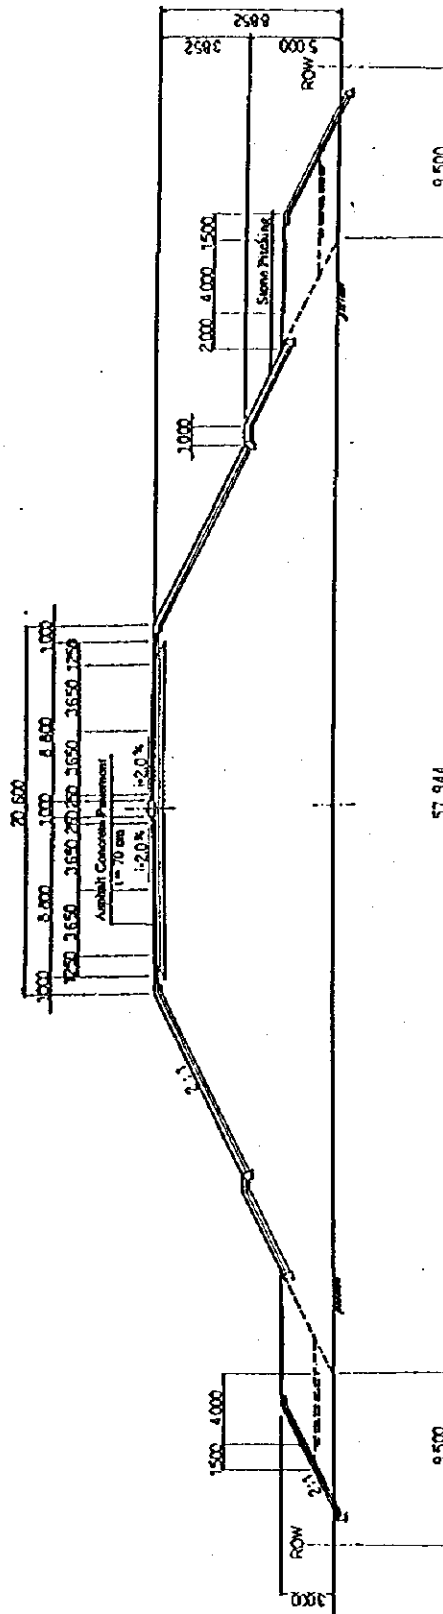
Typical Cross Section of Approach Embankment on the West Bank
